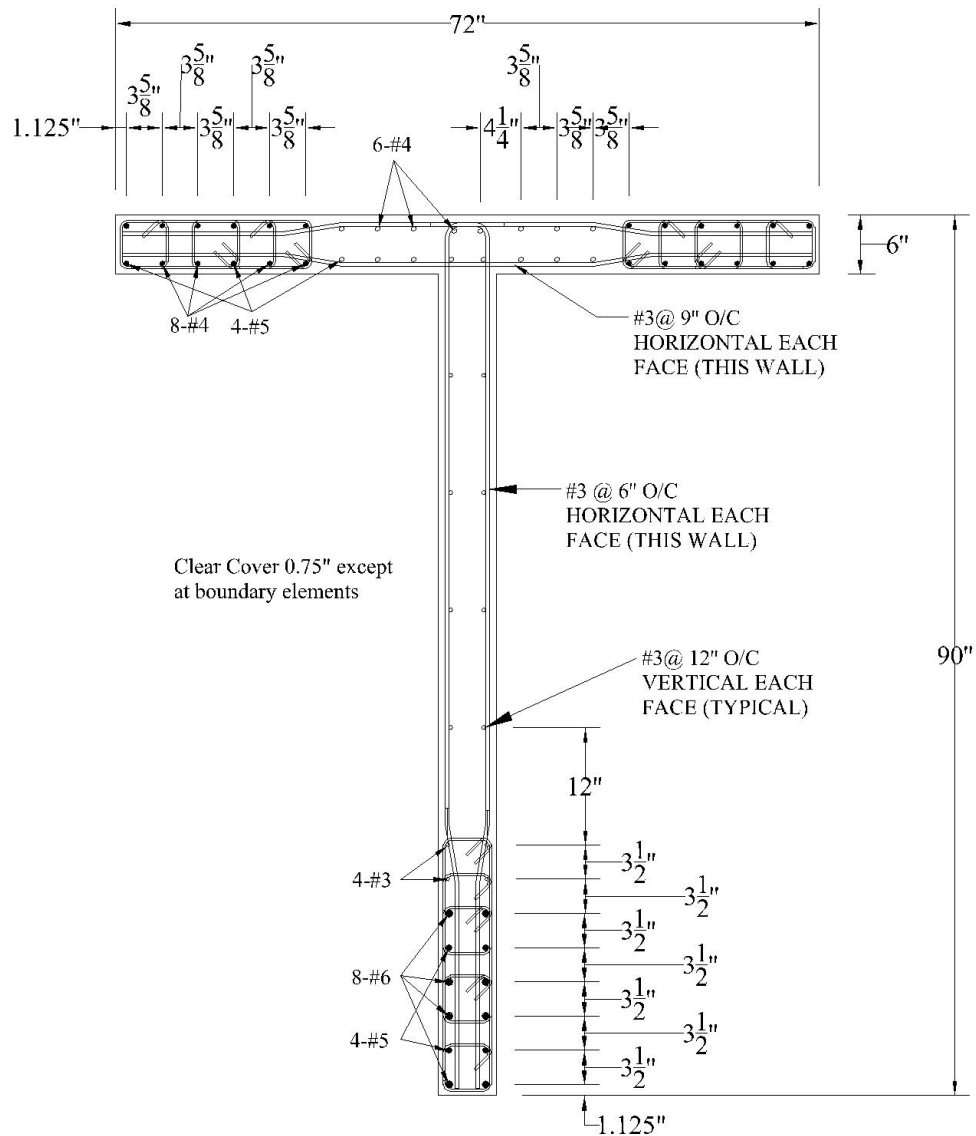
Cross-Sectional Dimensions and Reinforcement Details of Test Specimen NTW2
